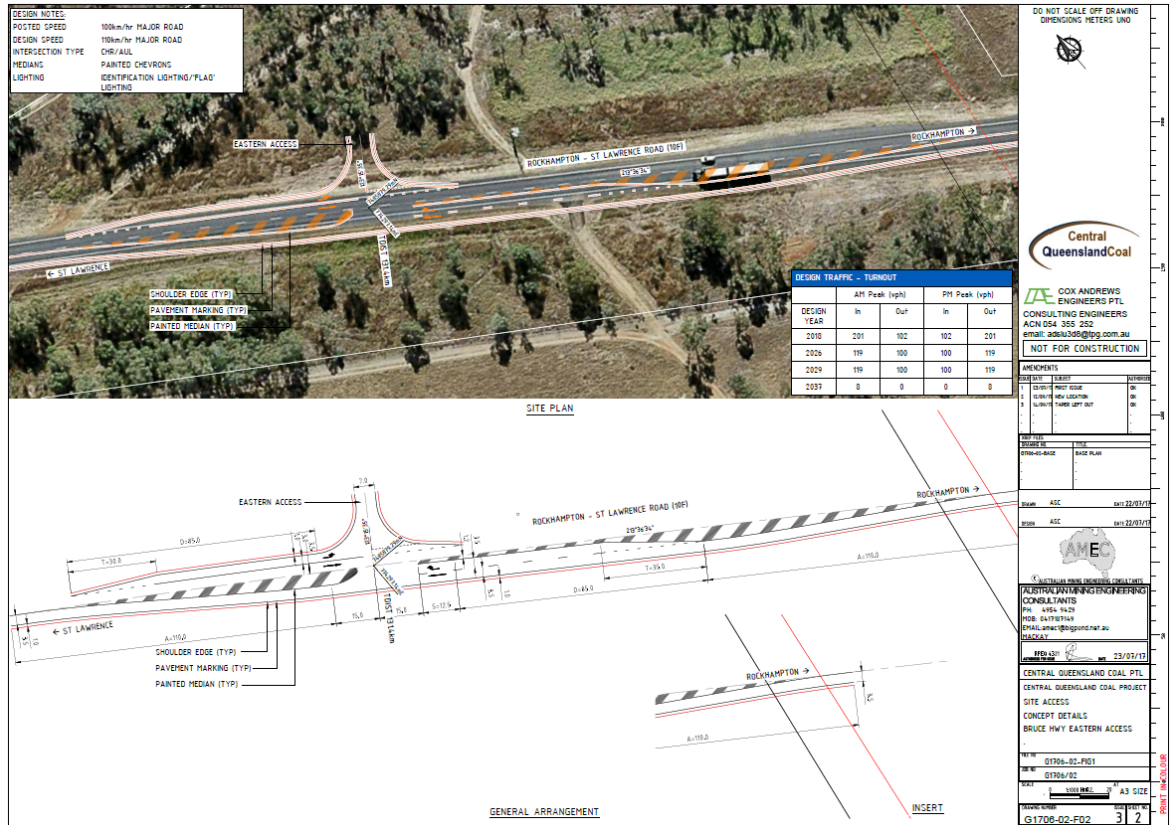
Revised site access concept details Bruce Highway eastern access
